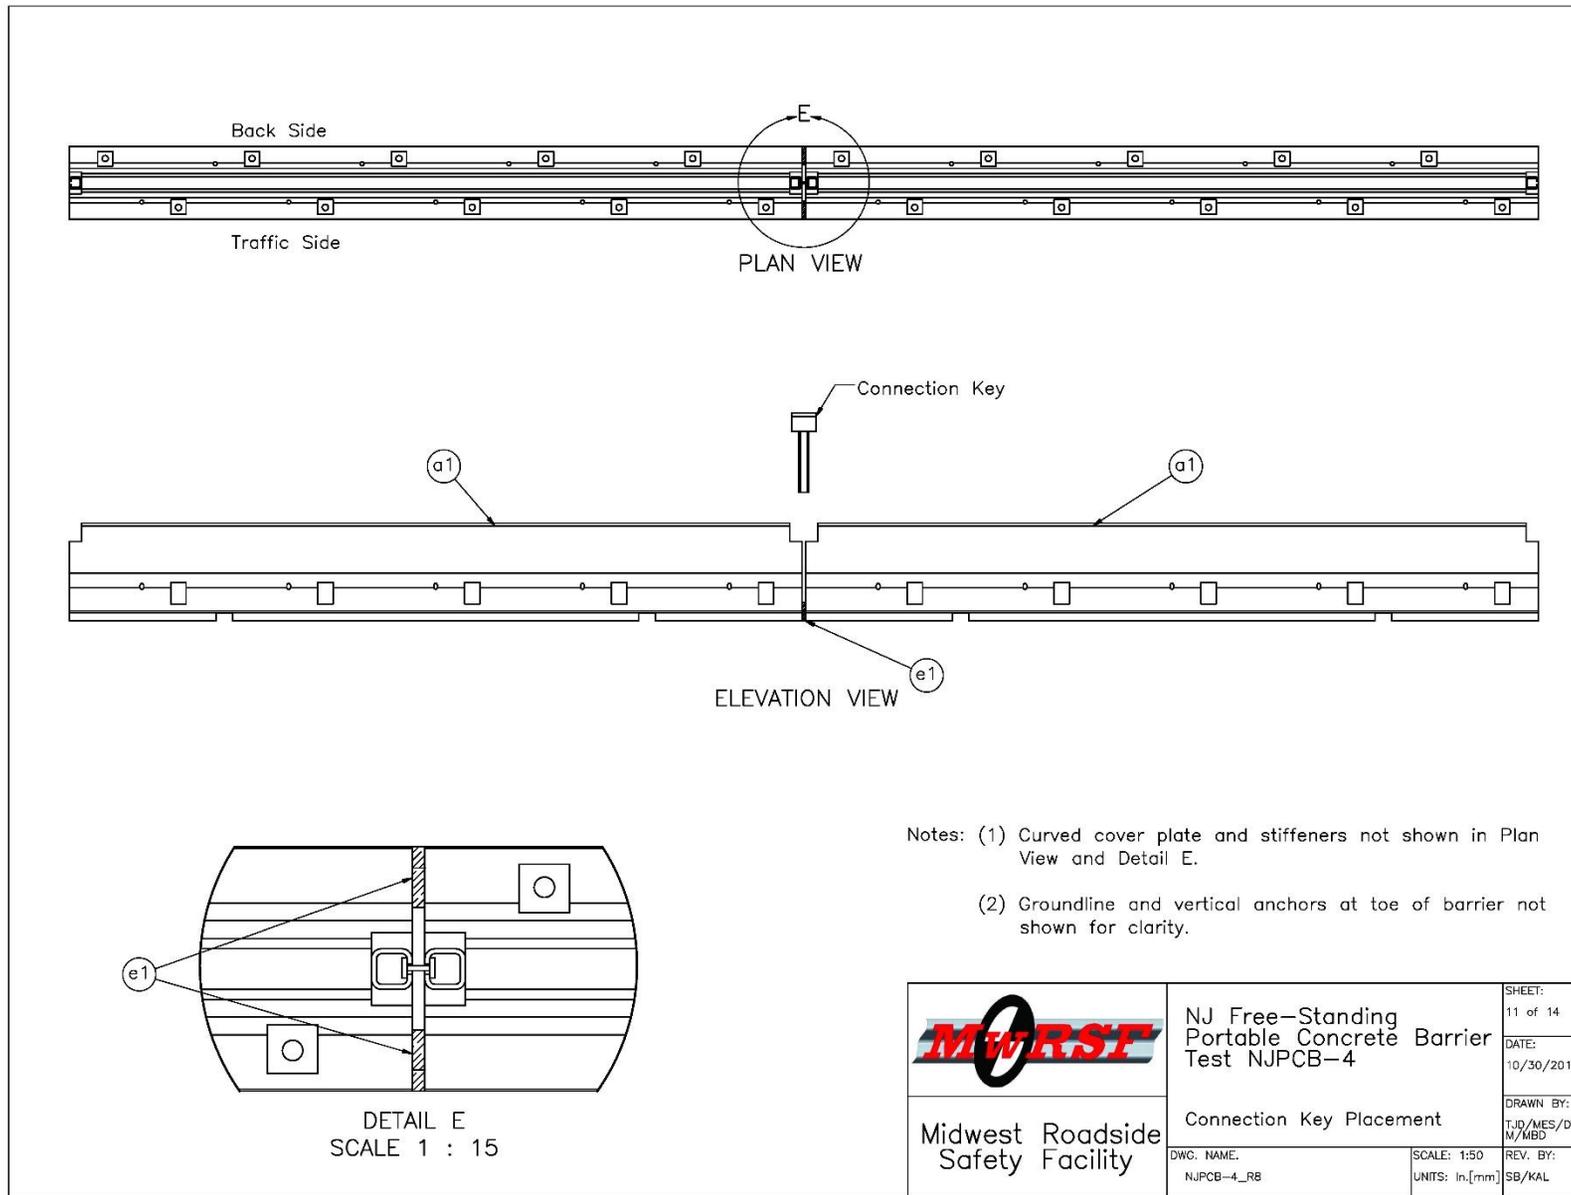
Connection Key Placement Details, Test No. NJPCB-4
